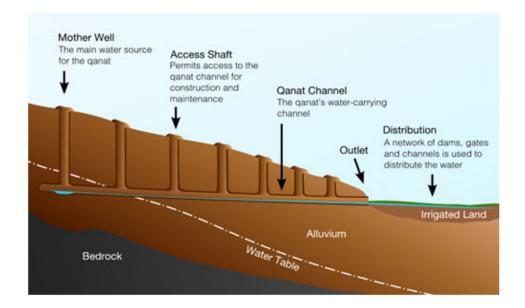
Cross Section Showing Qanats. (Source: Barron and Salas, 2009)
